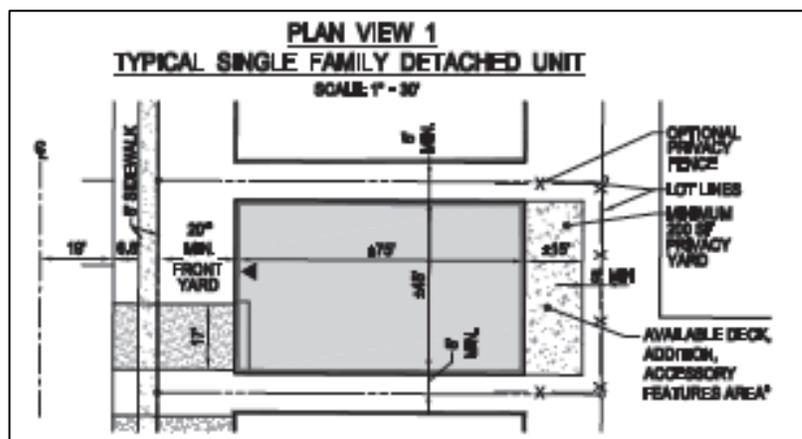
SFD Lot Typical (Source: CDP/FDP)
